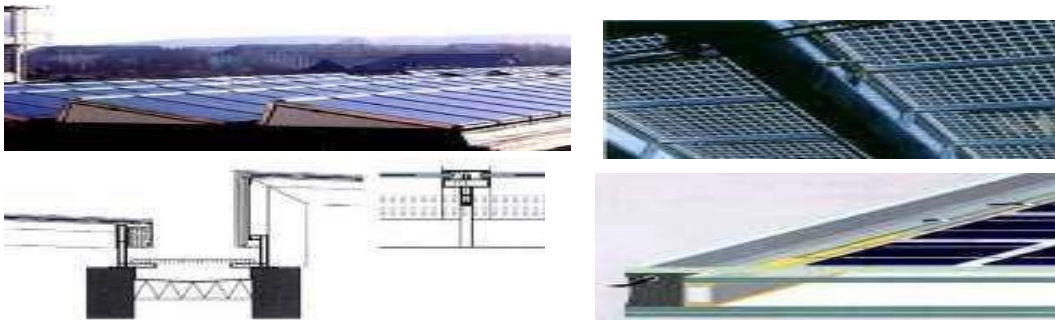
Glass roof application with PV modules (Keles, 2008)
